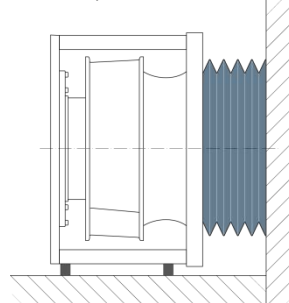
Side view of a RadiPac with cube design and bellow expansion sleeve on the intake side
